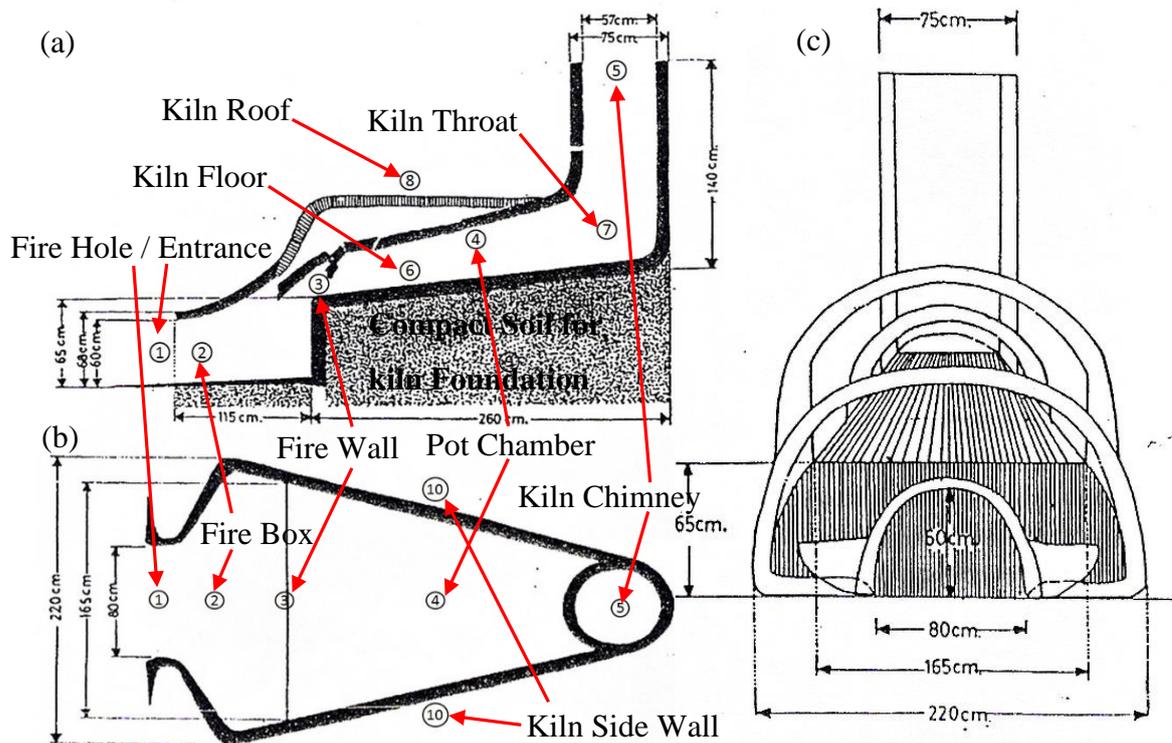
Drawing illustrating the ceramic kiln skeleton (a) Side section-view of Kiln, (b) Top view of kiln, and (c) Front view of Kiln (From Prishanchit and Pengtako, 1997).
